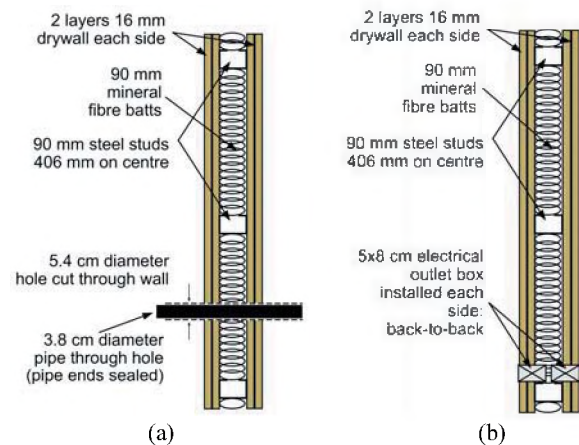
Wall configurations: (a) sealed pipe passed through wall, (b) back-to-back electrical boxes.
